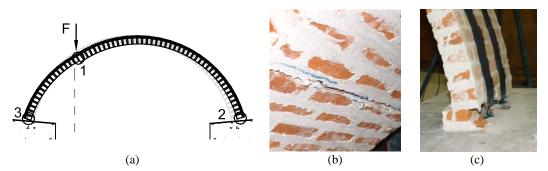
Continuous extrados strengthening: (a) failure mechanism developed; (b) intrados view of hinge 1; (c) sliding along a mortar joint close to the right support.
